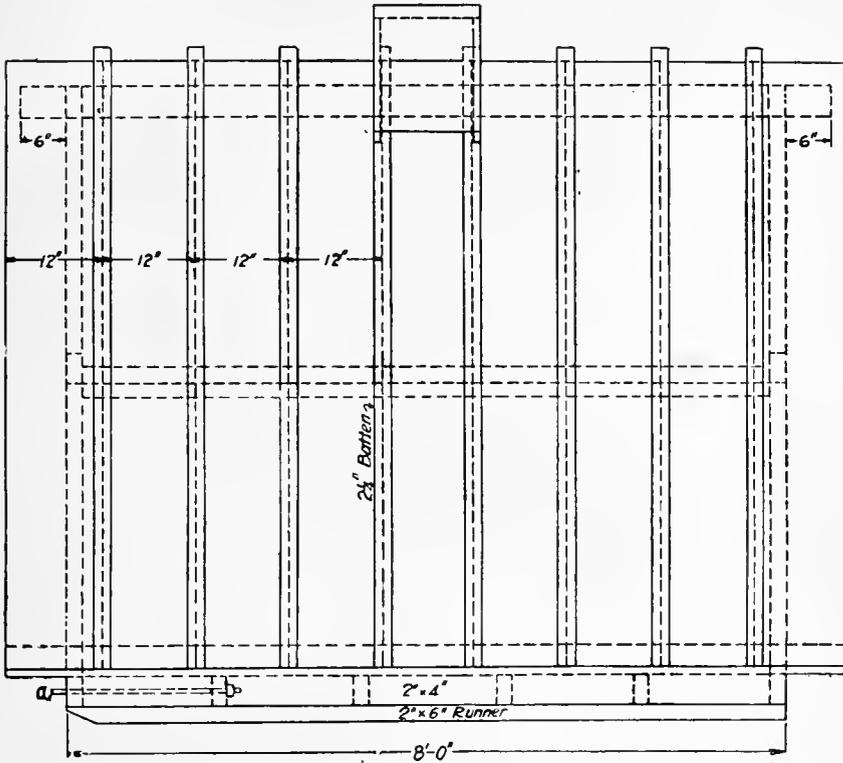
Side Elevation of A-Shaped Hog House. Eyebolt at A.
